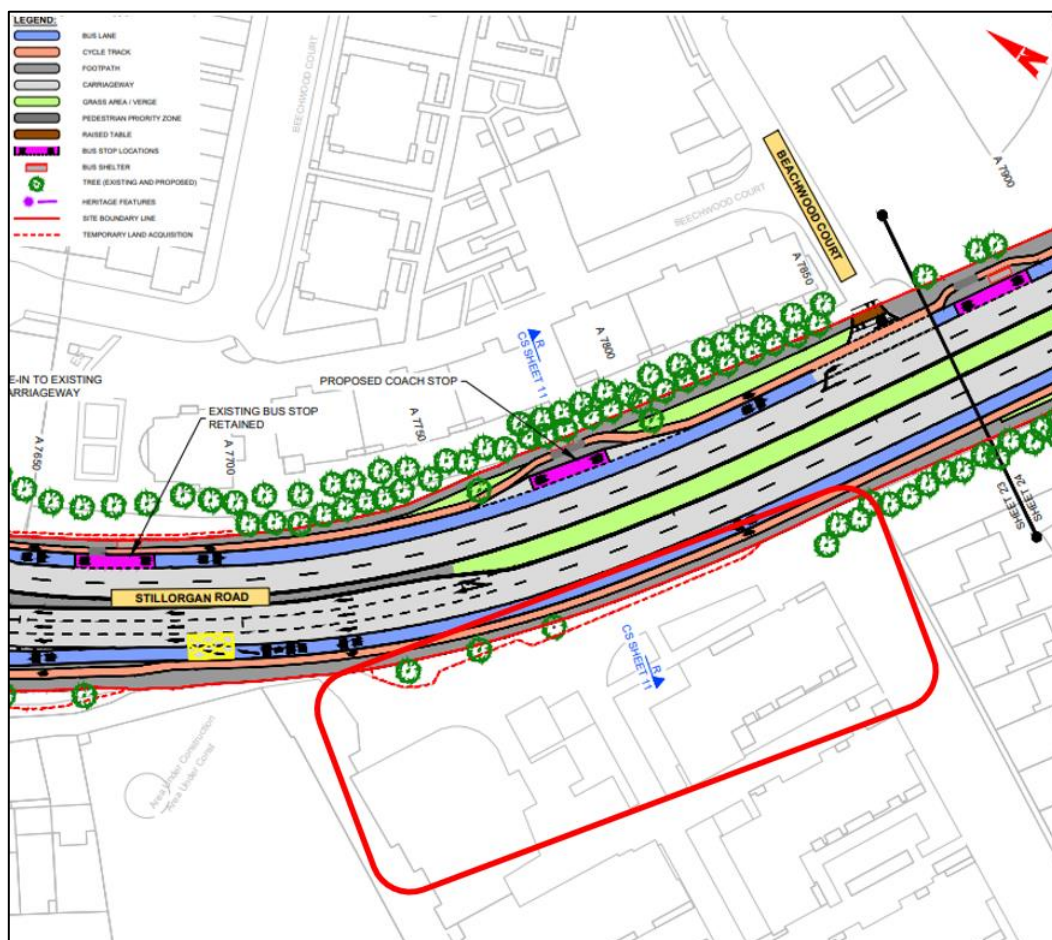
Extract from General Arrangement Drawing at Stillorgan Road (Sheet 23)
